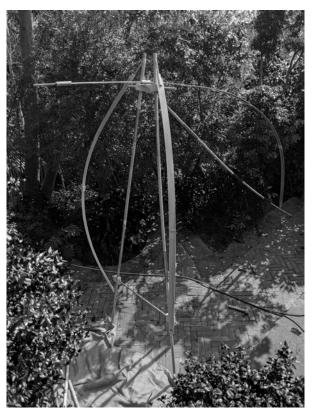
1:1 Structural Model - Timber poles, plywood, timber details (failed due to weak timber poles)
